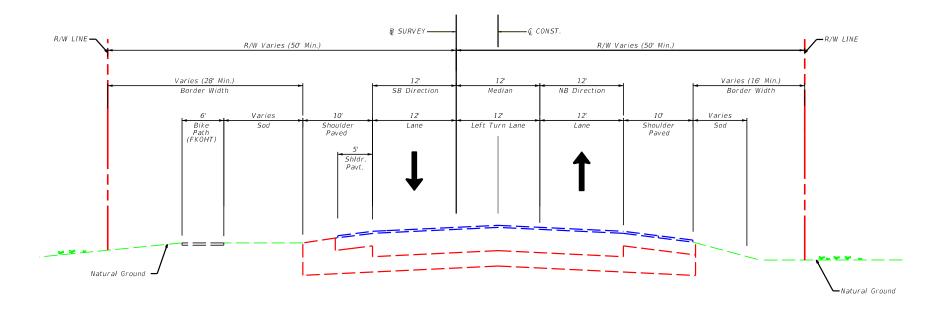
Existing Typical Section from N of East Ridge Road to N of Executive Bay Club
